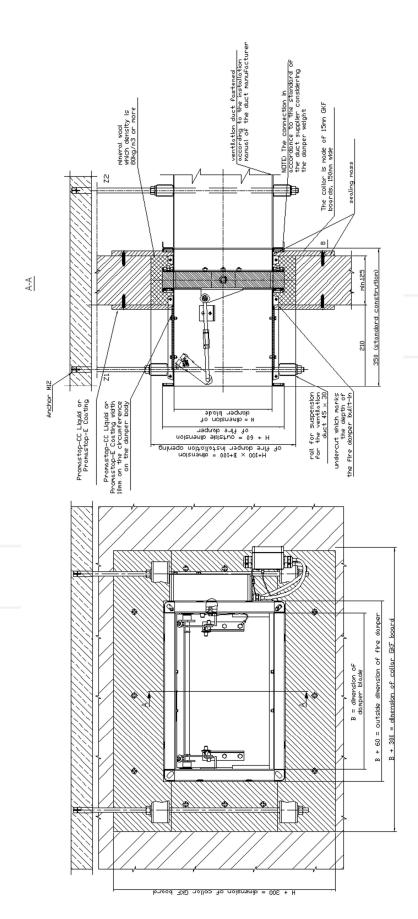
Installation method of fire dampers KWP-O-Ex in rigid wall
